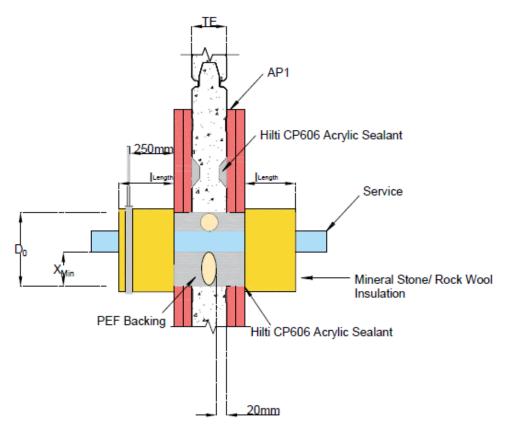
Metal pipes in minimum 51 mm Korok panel system with 2  $\times$  AP1 and AP3 additional protection
